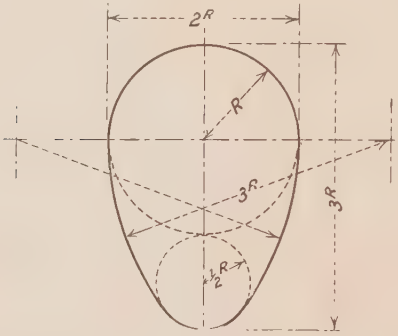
Standard Egg-shaped Section for Brick Sewer.
